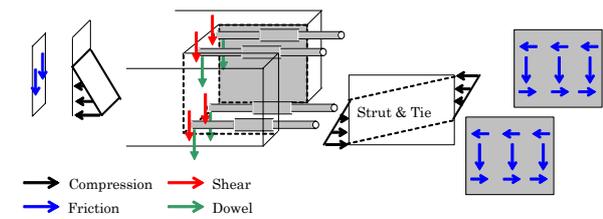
Assumed forces at connection of sleeved beam No.2-1
